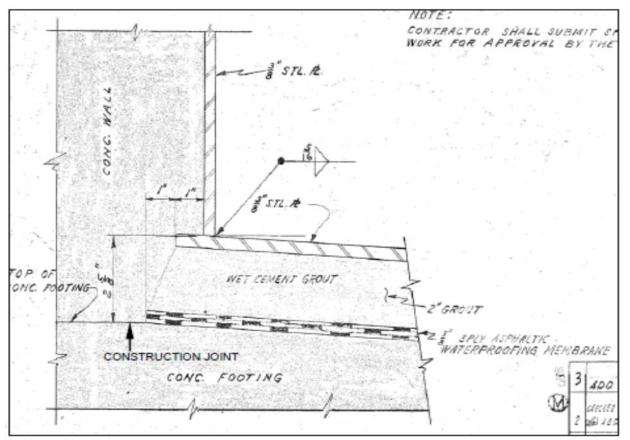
SX Farm Tank Bottom Liner to Sidewall Design Detail [6]
